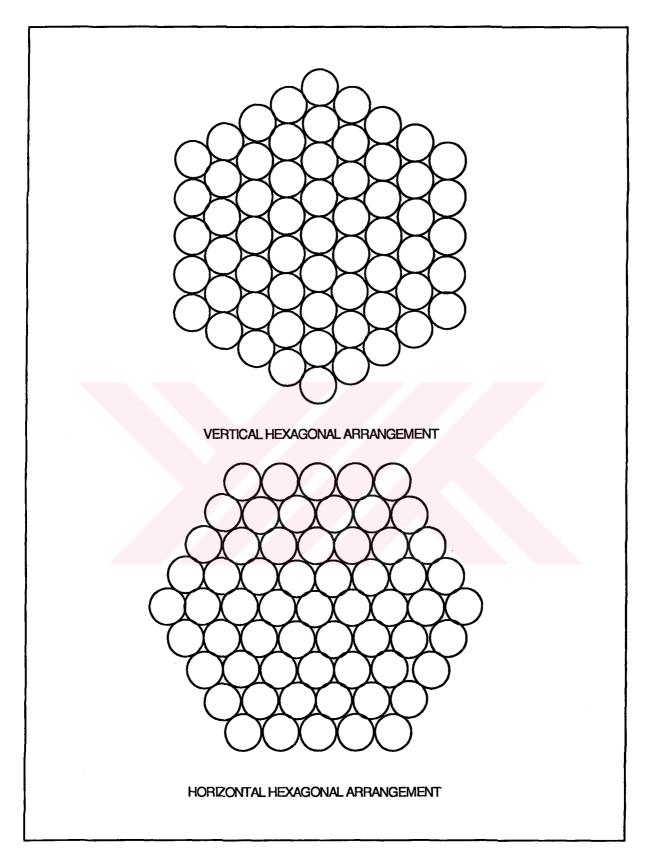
ARRANGEMENT OF STRANDS IN SUSPENSION BRIDGE MAIN CABLES
